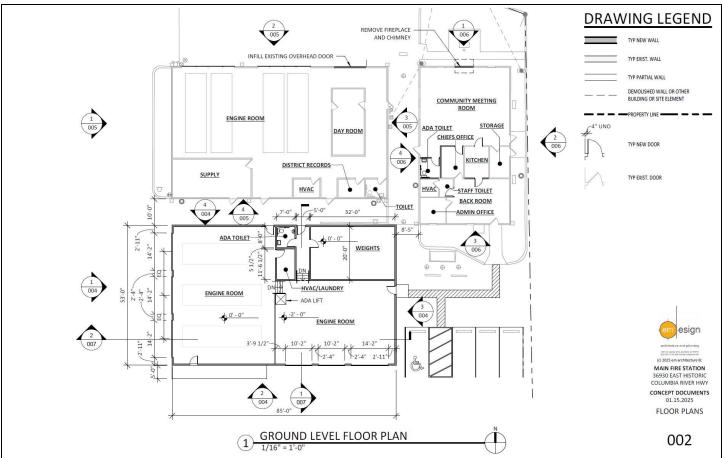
Plan drawings for proposed alterations to existing structures for the Corbett Fire District #62 Station upgrades, courtesy of EM Architecture LLC.
